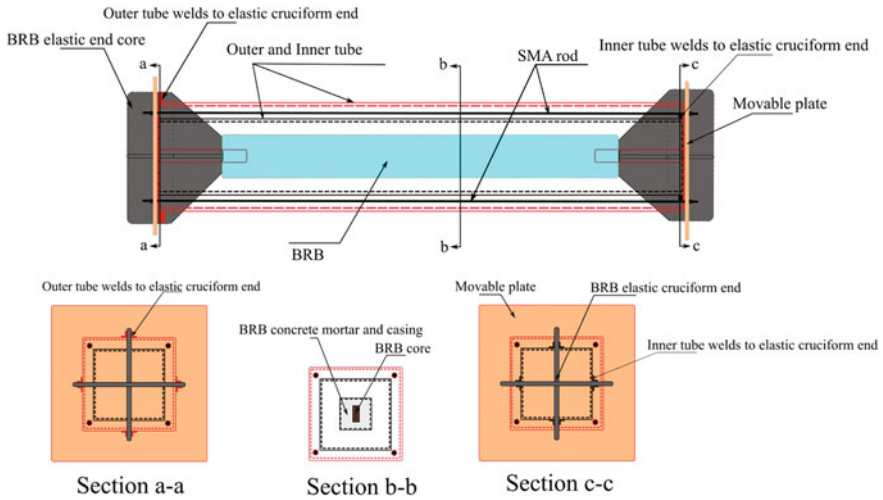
Longitudinal and cross-sectional views of SC-BRB specimen
